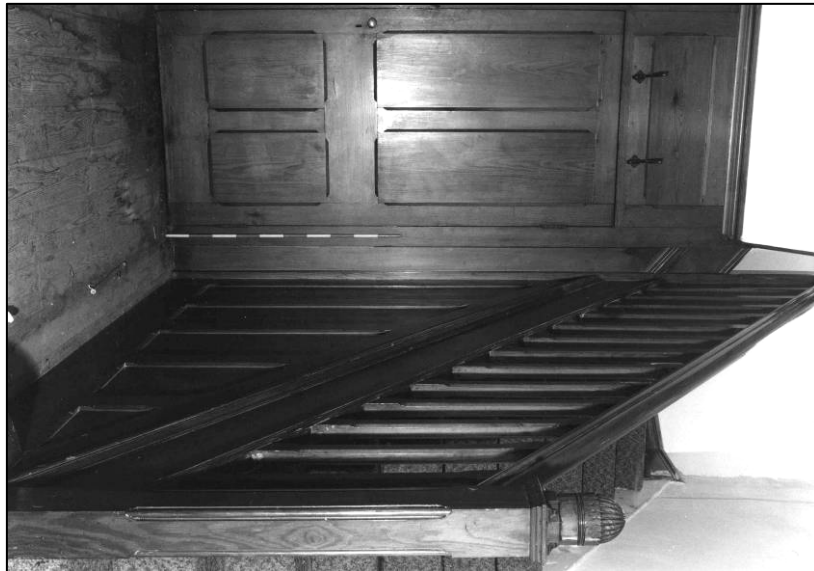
Church: GF entrance foyer, E stairs, coat rack and cupboard, looking E (photo 1/17) (top to right).
